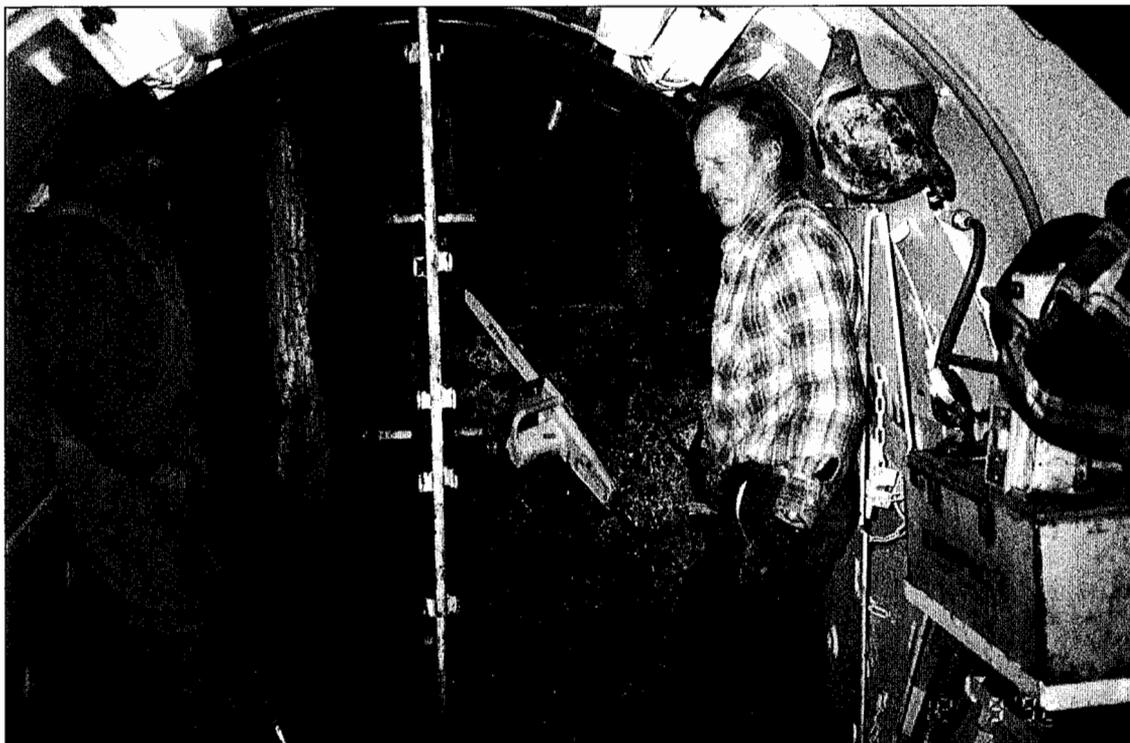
Construction personnel inside a pipe inspecting an abandoned timber pile seawall.
